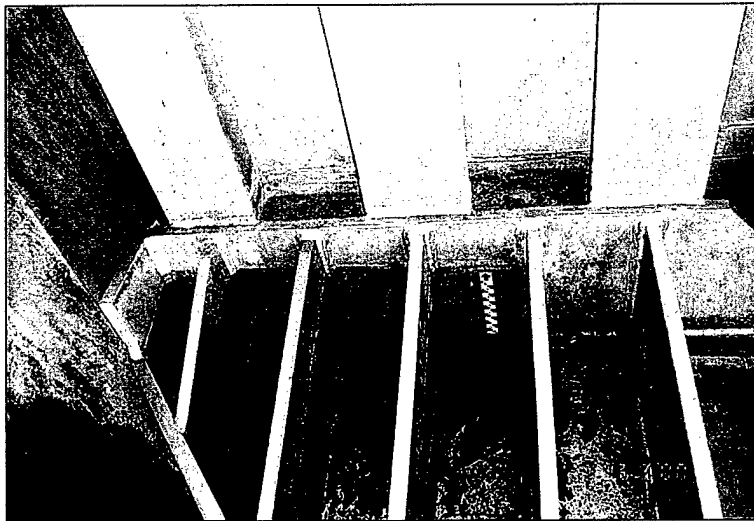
Standing water between stiffeners at ends of bottom horizontal girder, typical.
